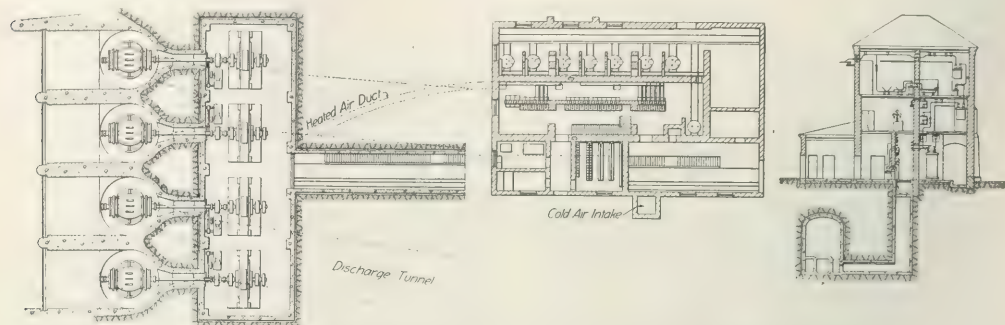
PLAN OF GENERATING ROOM AND SWITCH HOUSE AND CROSS-SECTION OF SWITCH HOUSE
